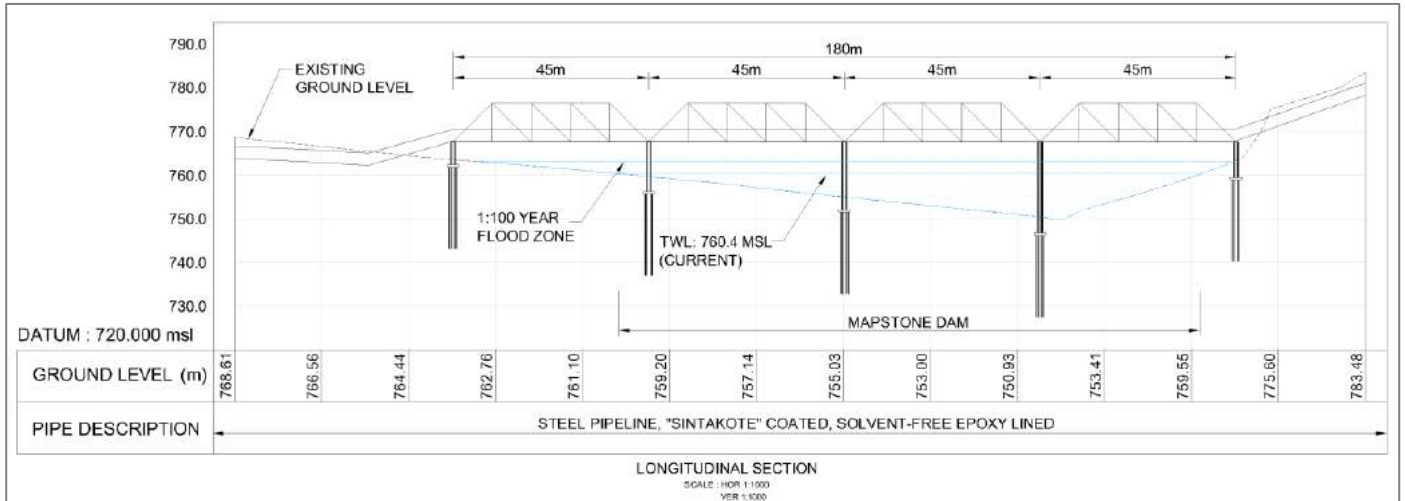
Longitudinal Section through Conventional Steel Pipe Bridge
